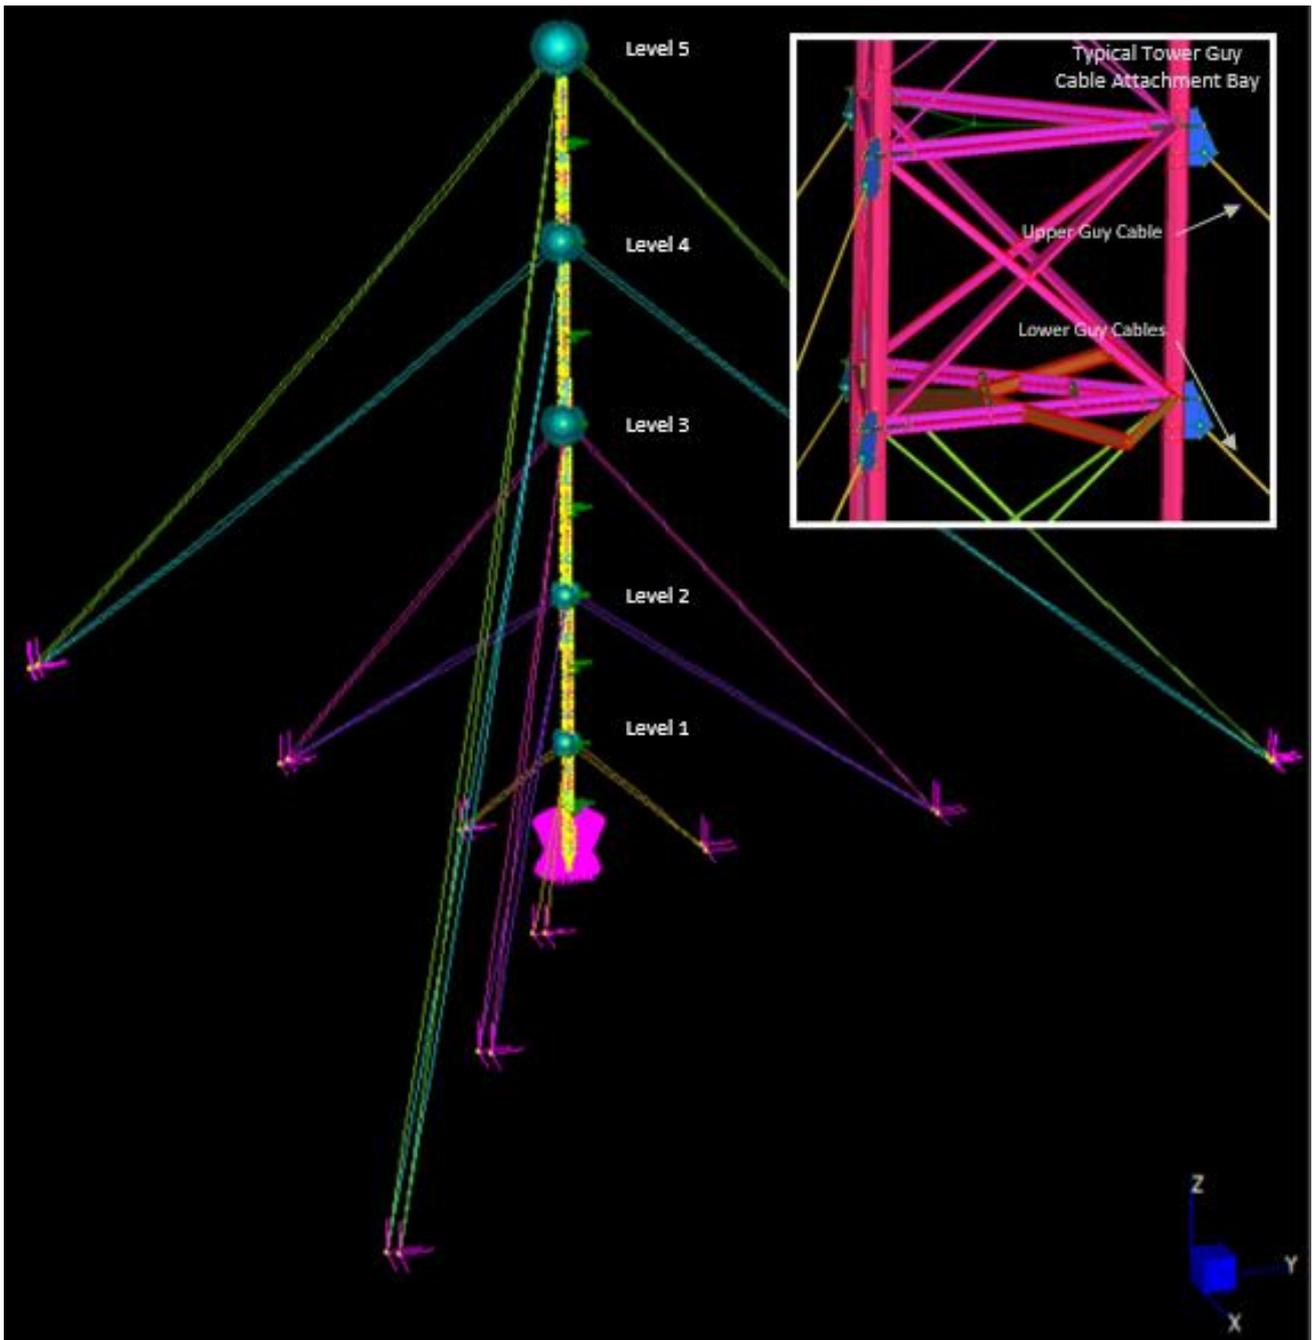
Tower, showing 30 Guy Cable Attachment Points
